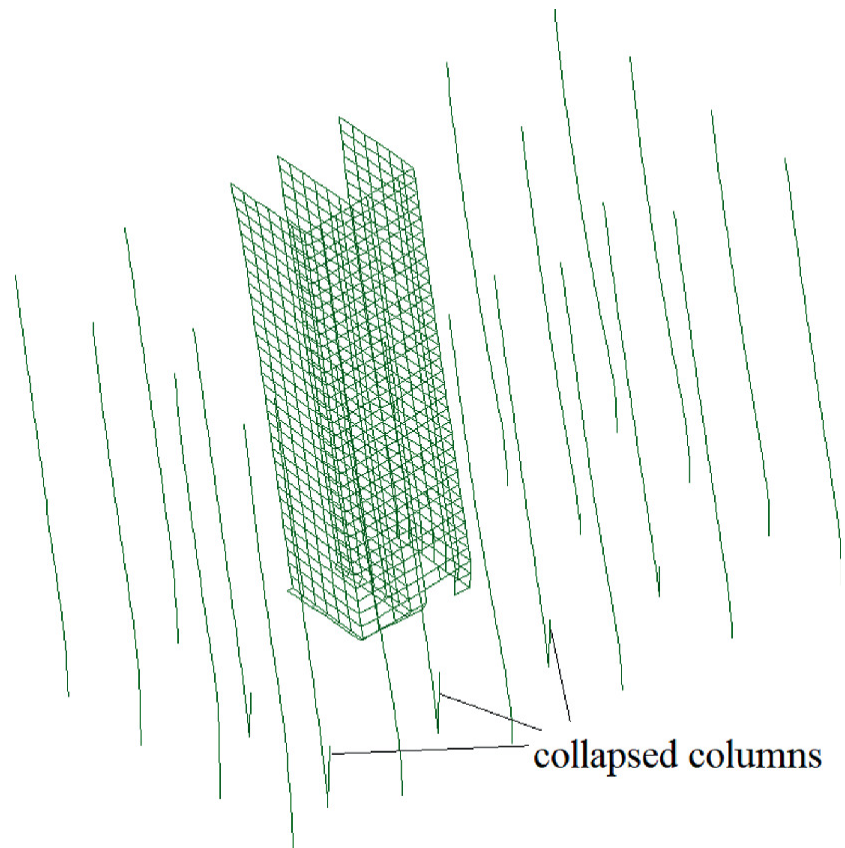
Collapse of the vertical bearing structures. No outrigger stiffeners
